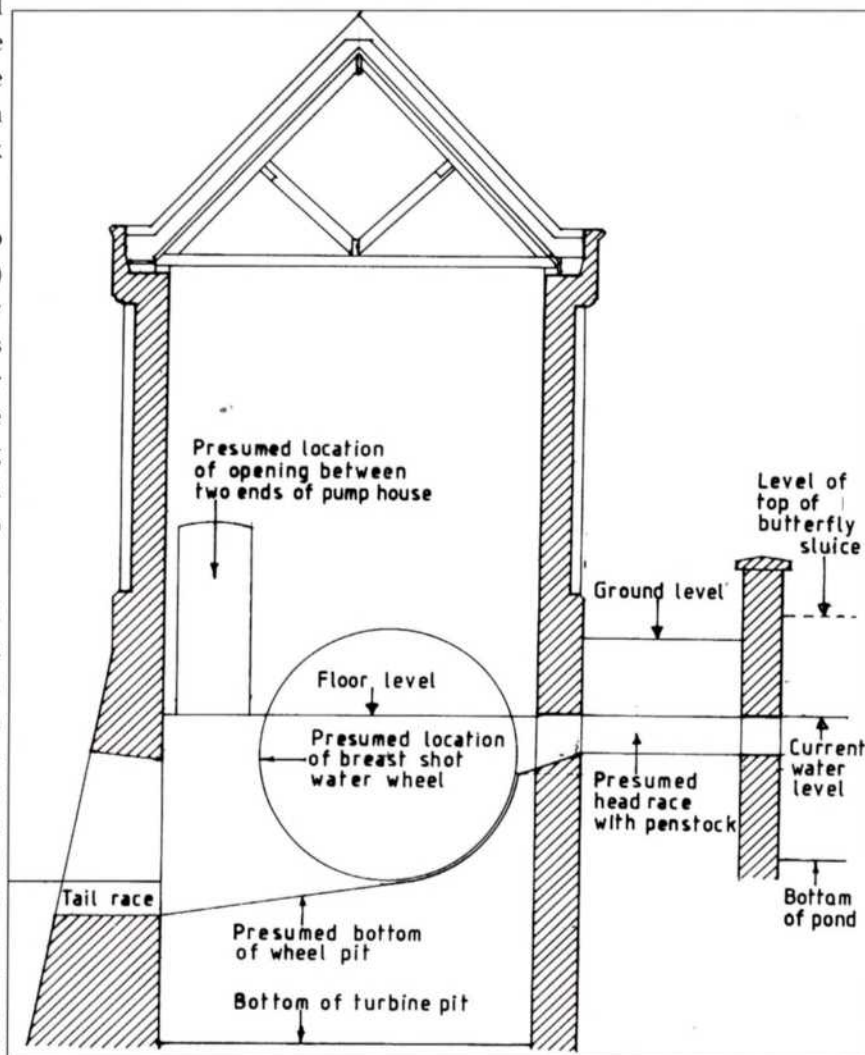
Section through Wheel Pit showing suggested location of water wheel
